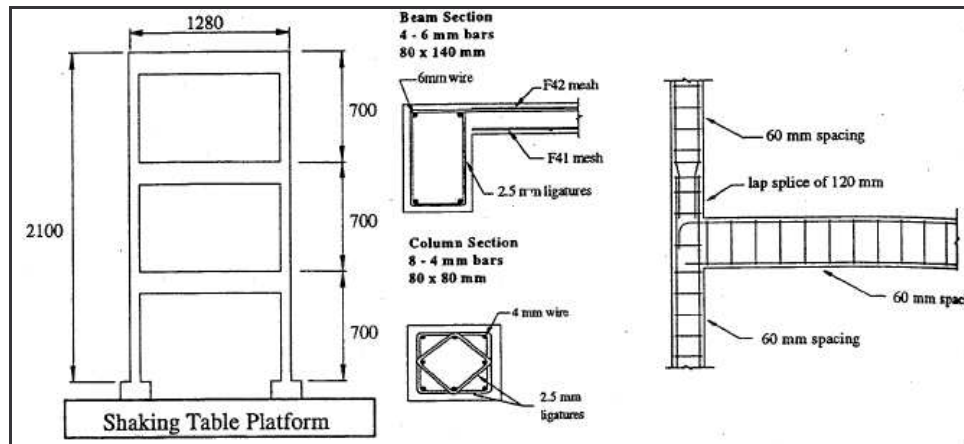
Elevation and joint detail of 1/5-scale model test structure
